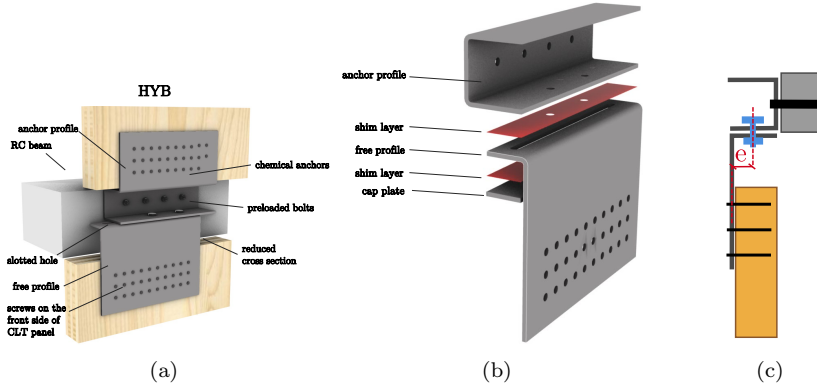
Specimen HYB tested in the current experimental campaign: (a) parts of the system in a real building, (b) parts of the specimen used for testing, (c) eccentricity of the specimen.
